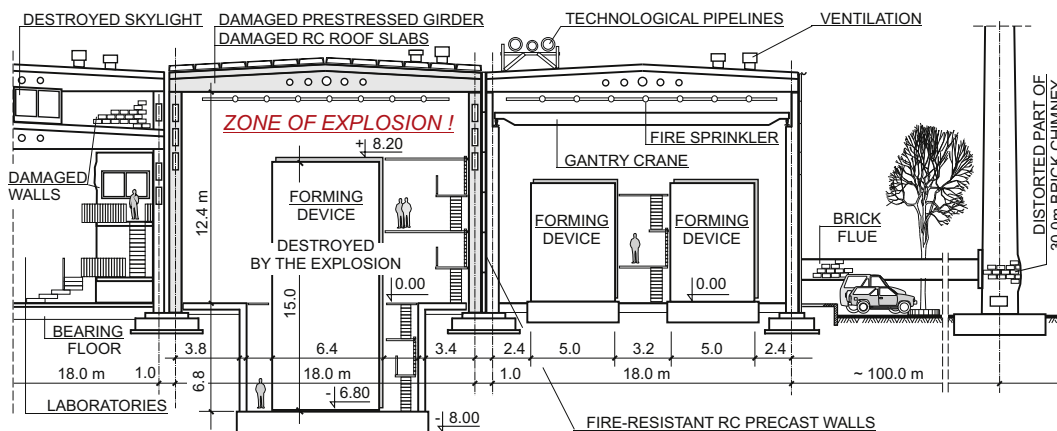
Cross-section of the industrial halls and the arrangement of the structural elements.
